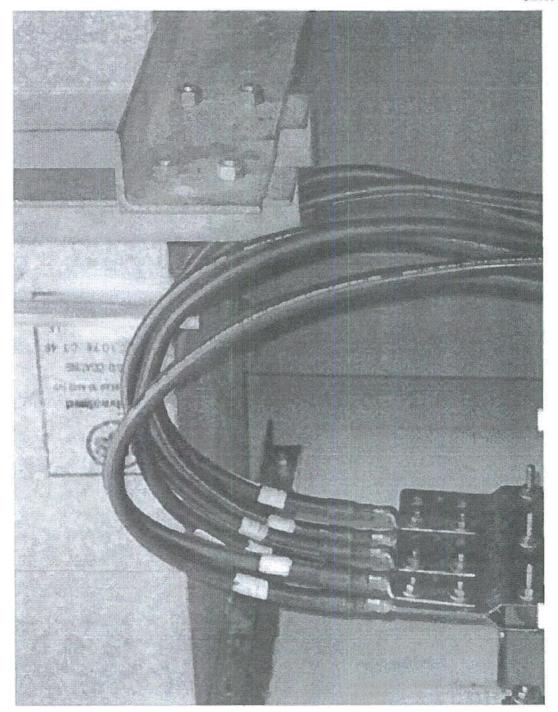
Battery Cable and HVAC Spacing (Unit 2 Control TD-T13)
